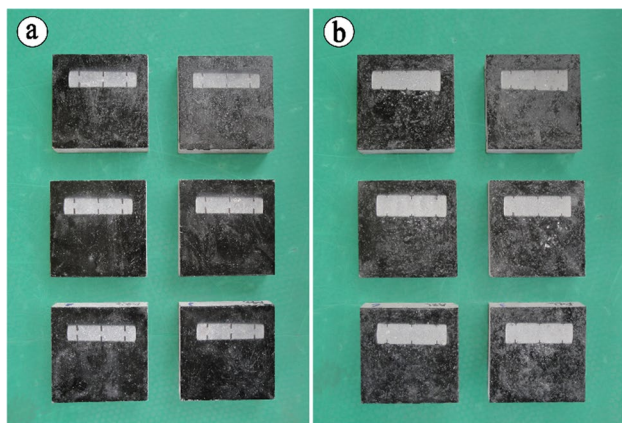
Fracture of specimens after testing (a) RS and (b) LT
